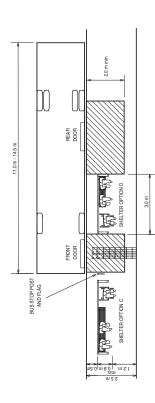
Bus Passenger Shelter Location Options C and D - Roadside width > 2.5 m
